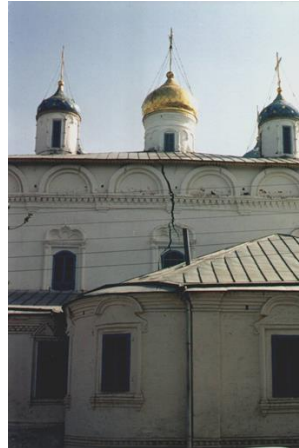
The crack above the window opening of the temple (northern facade).
